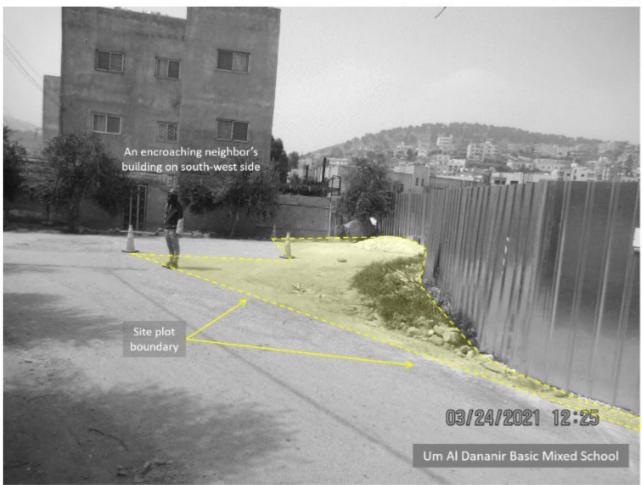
There is an encroachment of the existing neighbor's building toward the site
